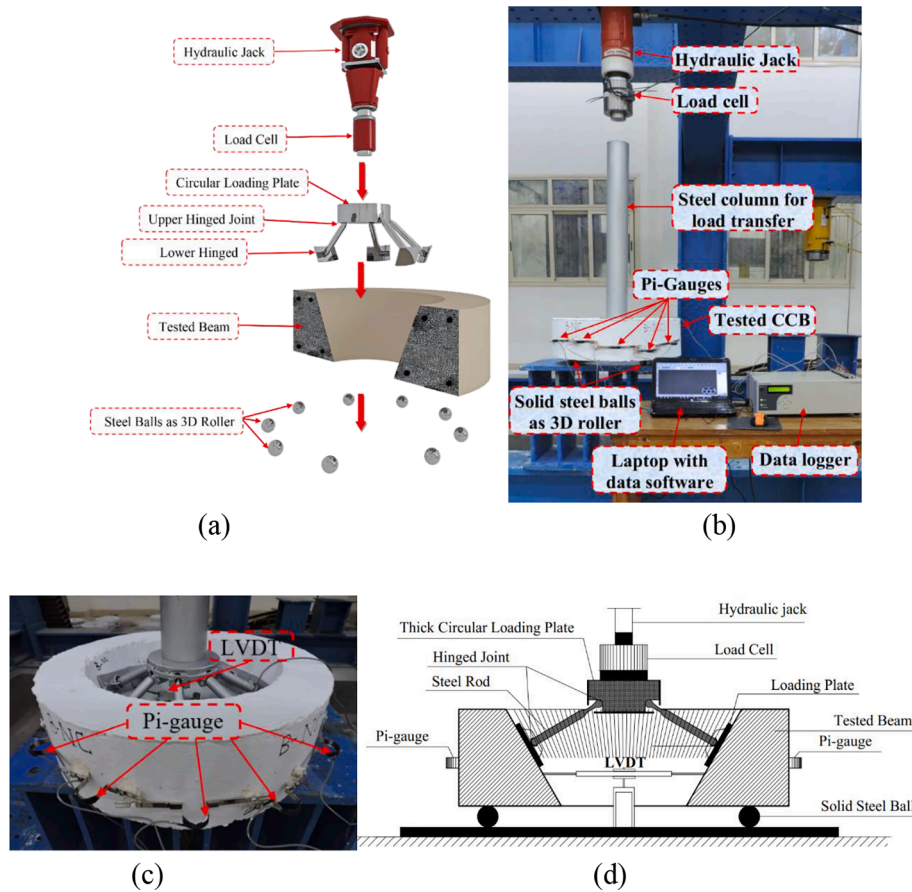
Test set-up and details of the instrumentations: (a) Schematic of test set-up, (b) Picture of test set-up, (c) Instrumentation, and (d) Schematic details.
